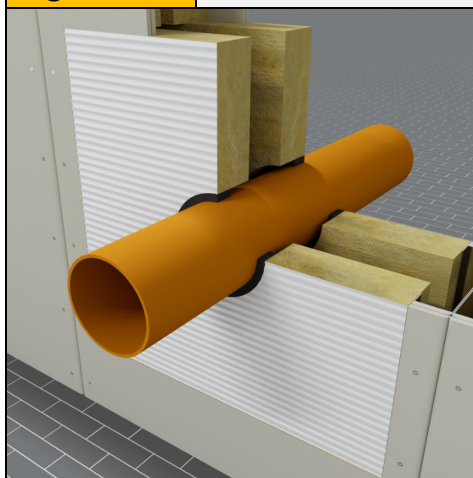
Combustible pipe with INTU FR GRAPHITE penetration seal, double mineral wool board
